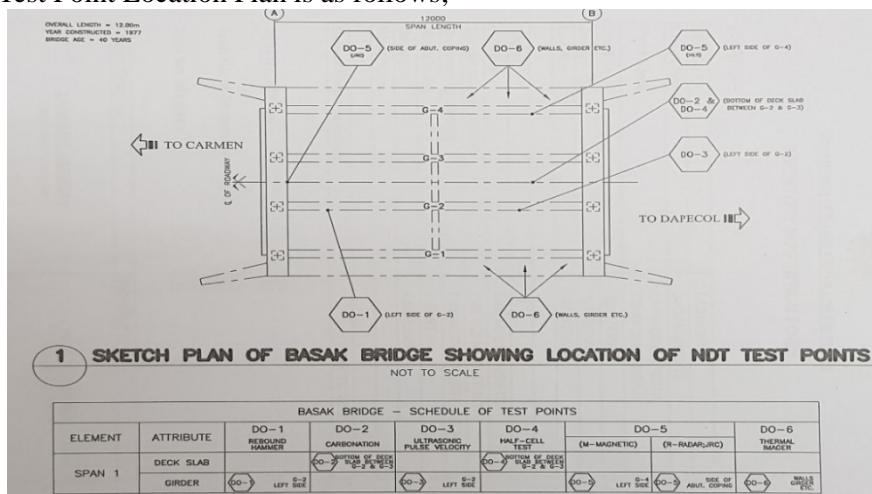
Test Point Location Plan (Mindanao Area)
